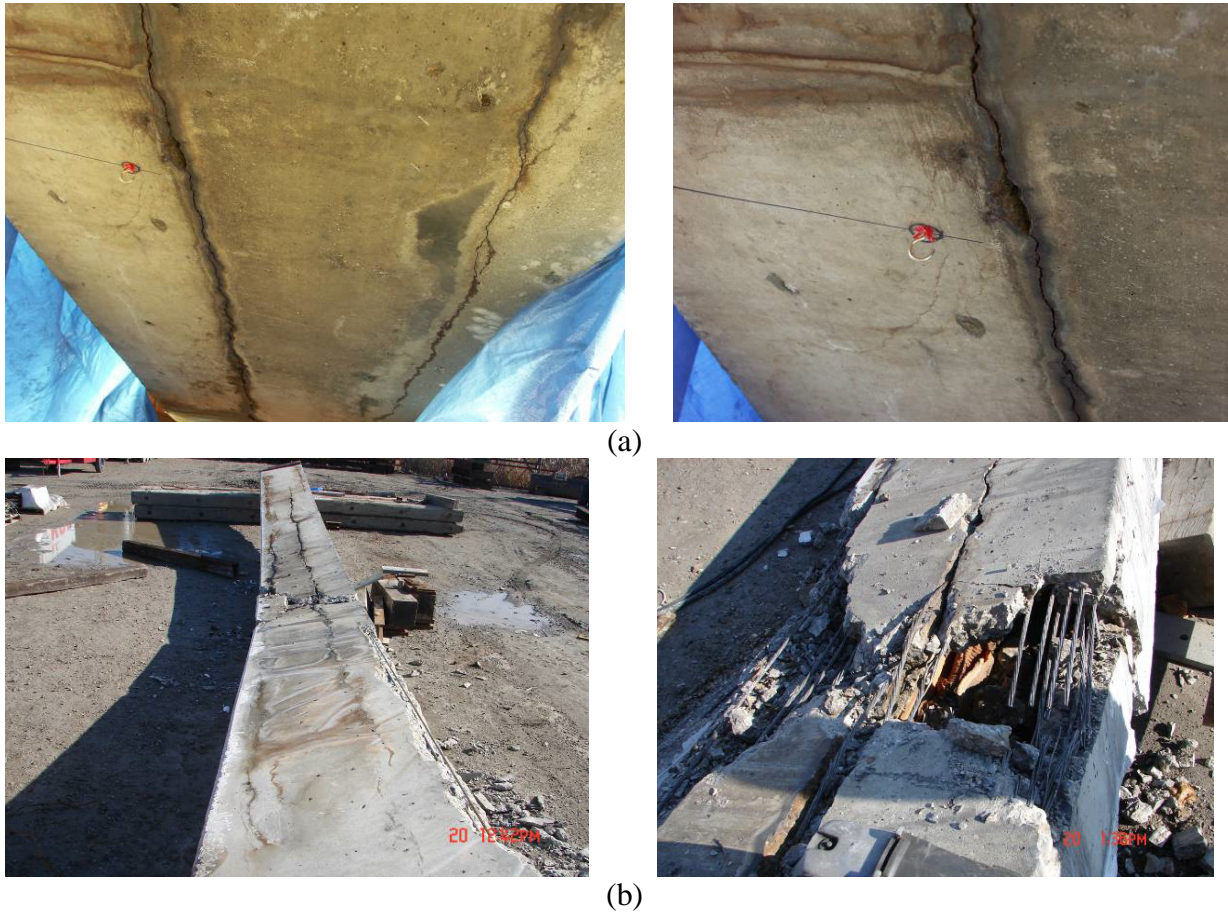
Beam bottom flange condition (a) before and (b) after the testing was performed
